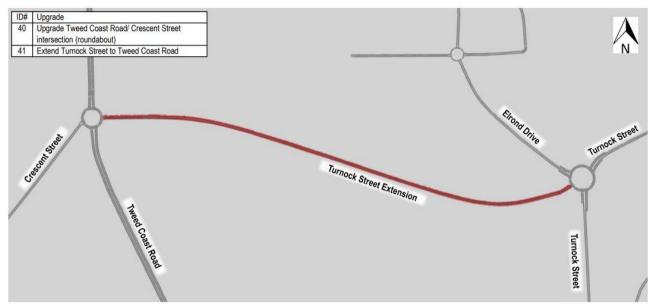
Proposed Turnock Street Extension (Source: 2017 TRDS report)
